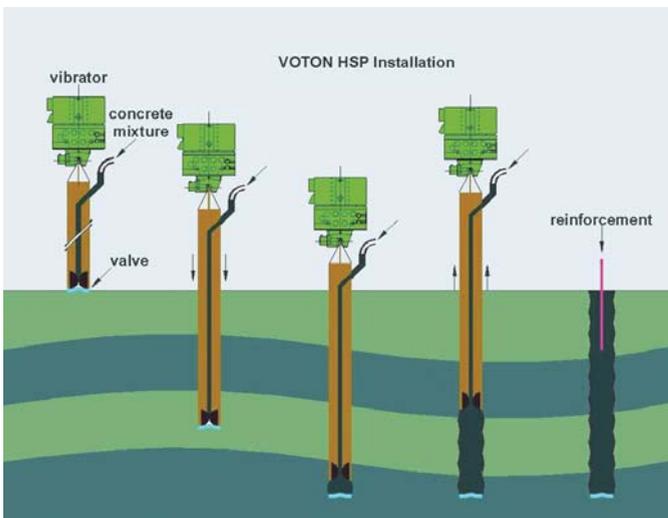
Schematic view of the installation of HSP piles (www.voton-hsp.com).
